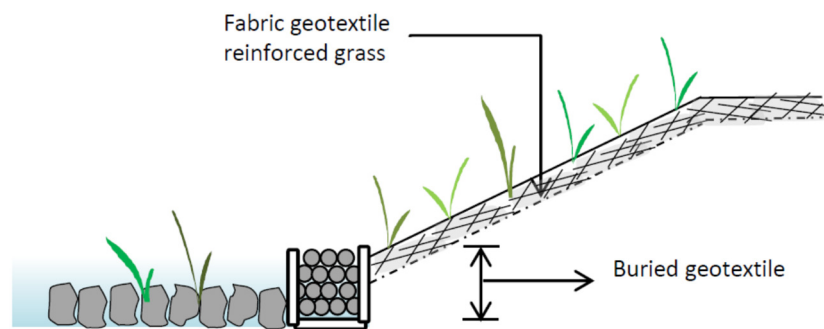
GEOTEXTILE REINFORCED GRASS EMBANKMENT
